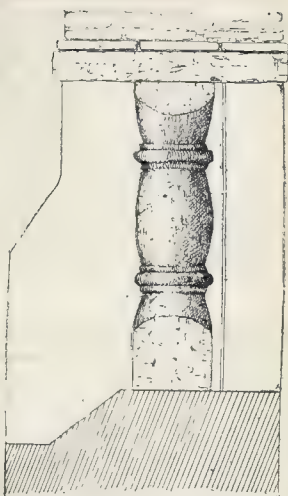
Section of Three-light Opening, West Wall, Brixworth Church; showing baluster.
